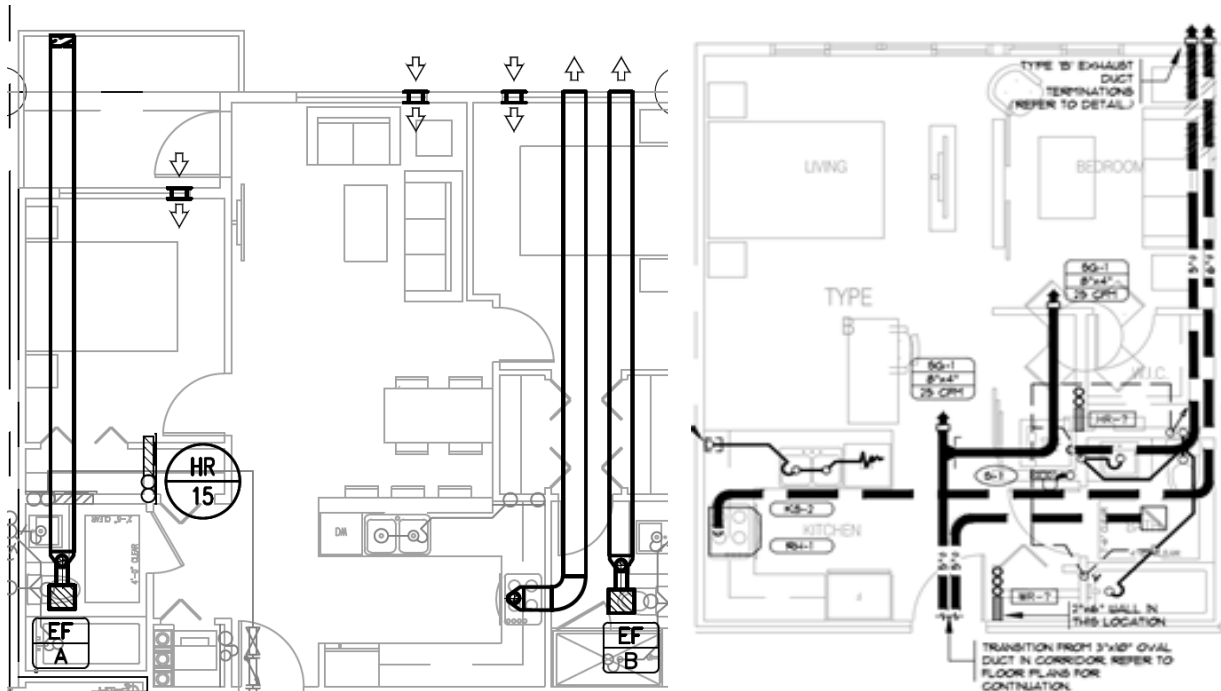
Apartment ventilation in Lot E (left) and Site B (right)
